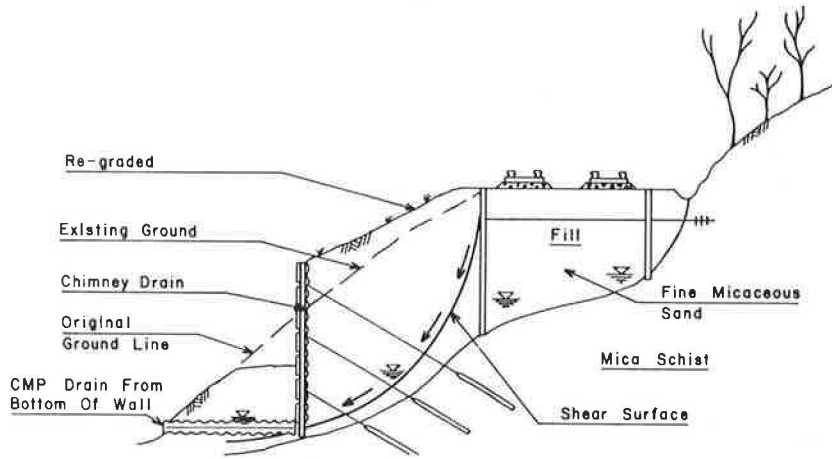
Active side hill embankment slide threatens main-line Clinchfield Railroad tracks.
